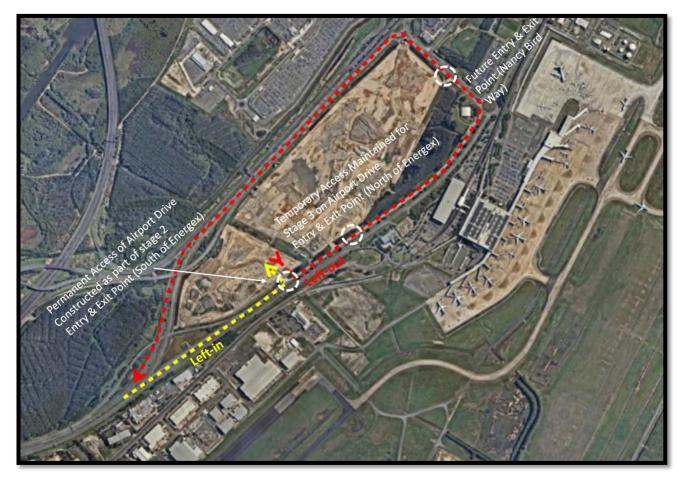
Construction routes from west accessing the site via temporary access points maintained from Earthworks
